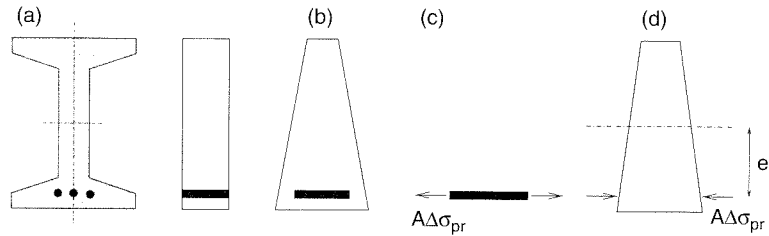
Cross-section of concrete beam with a prestressed tendon
